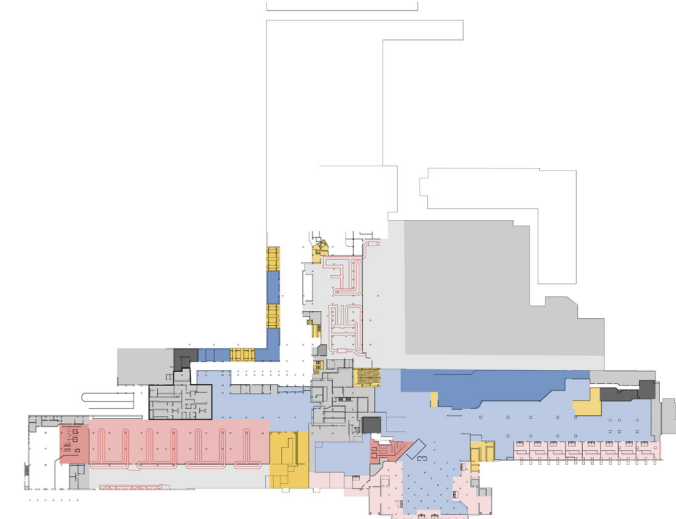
floorplan functions groundfloor Linate Airport (own work)
